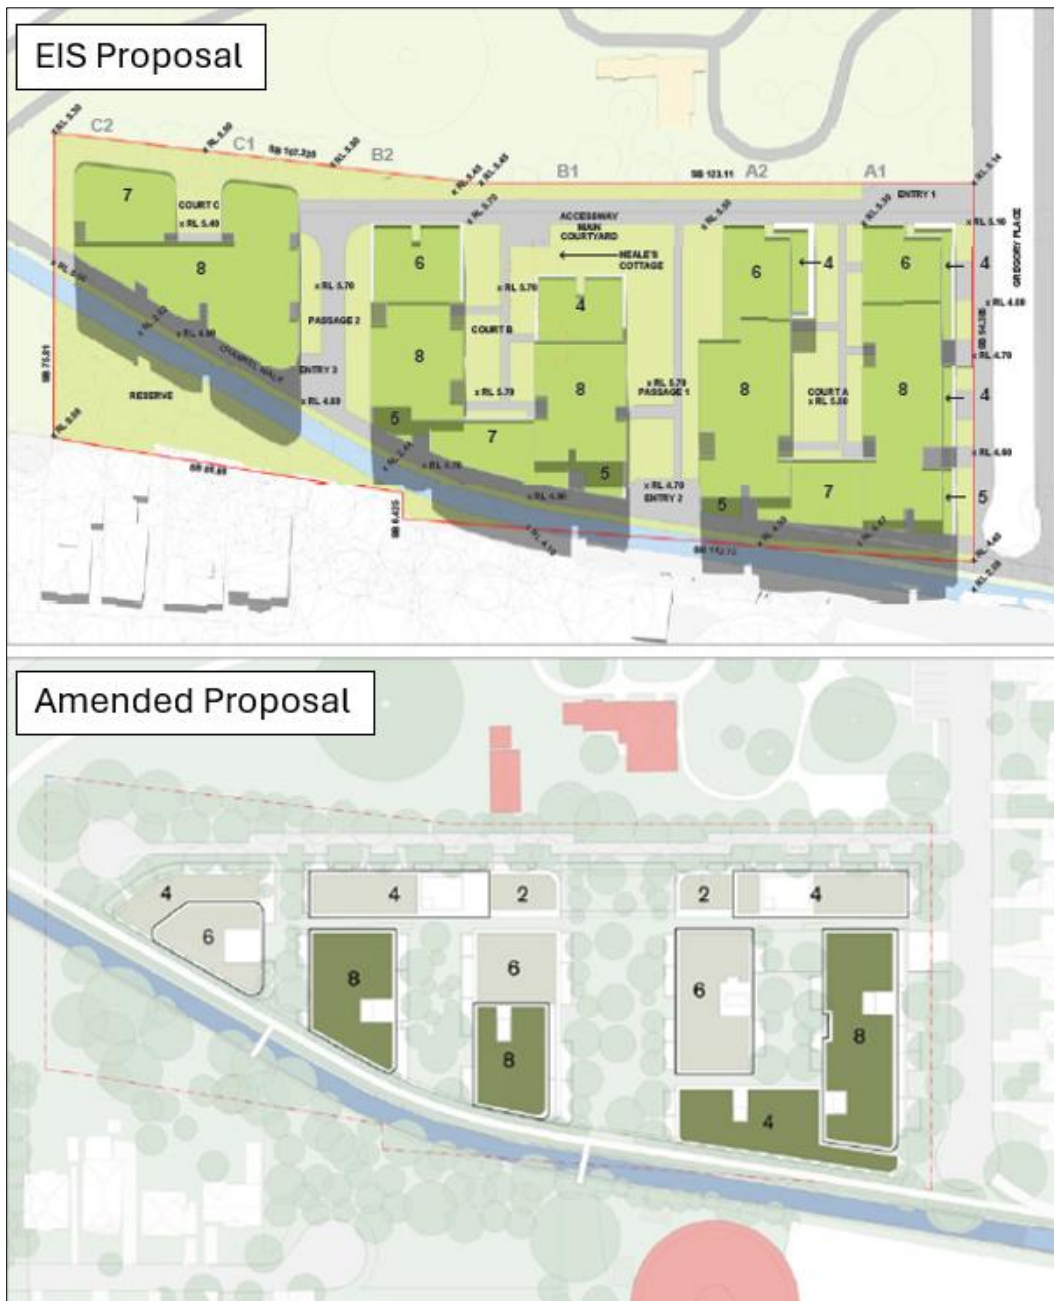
| EIS and amended building heights (Source: Applicant's EIS and Amendment Report)
